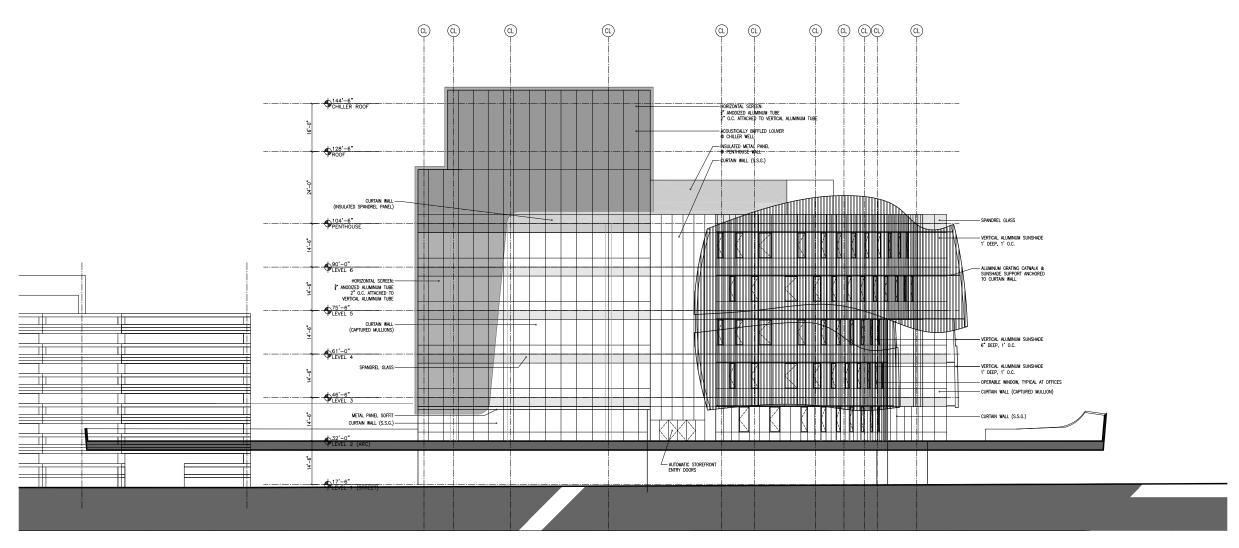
Building Elevation - NorthScale: 1/32" = 1'-0"
